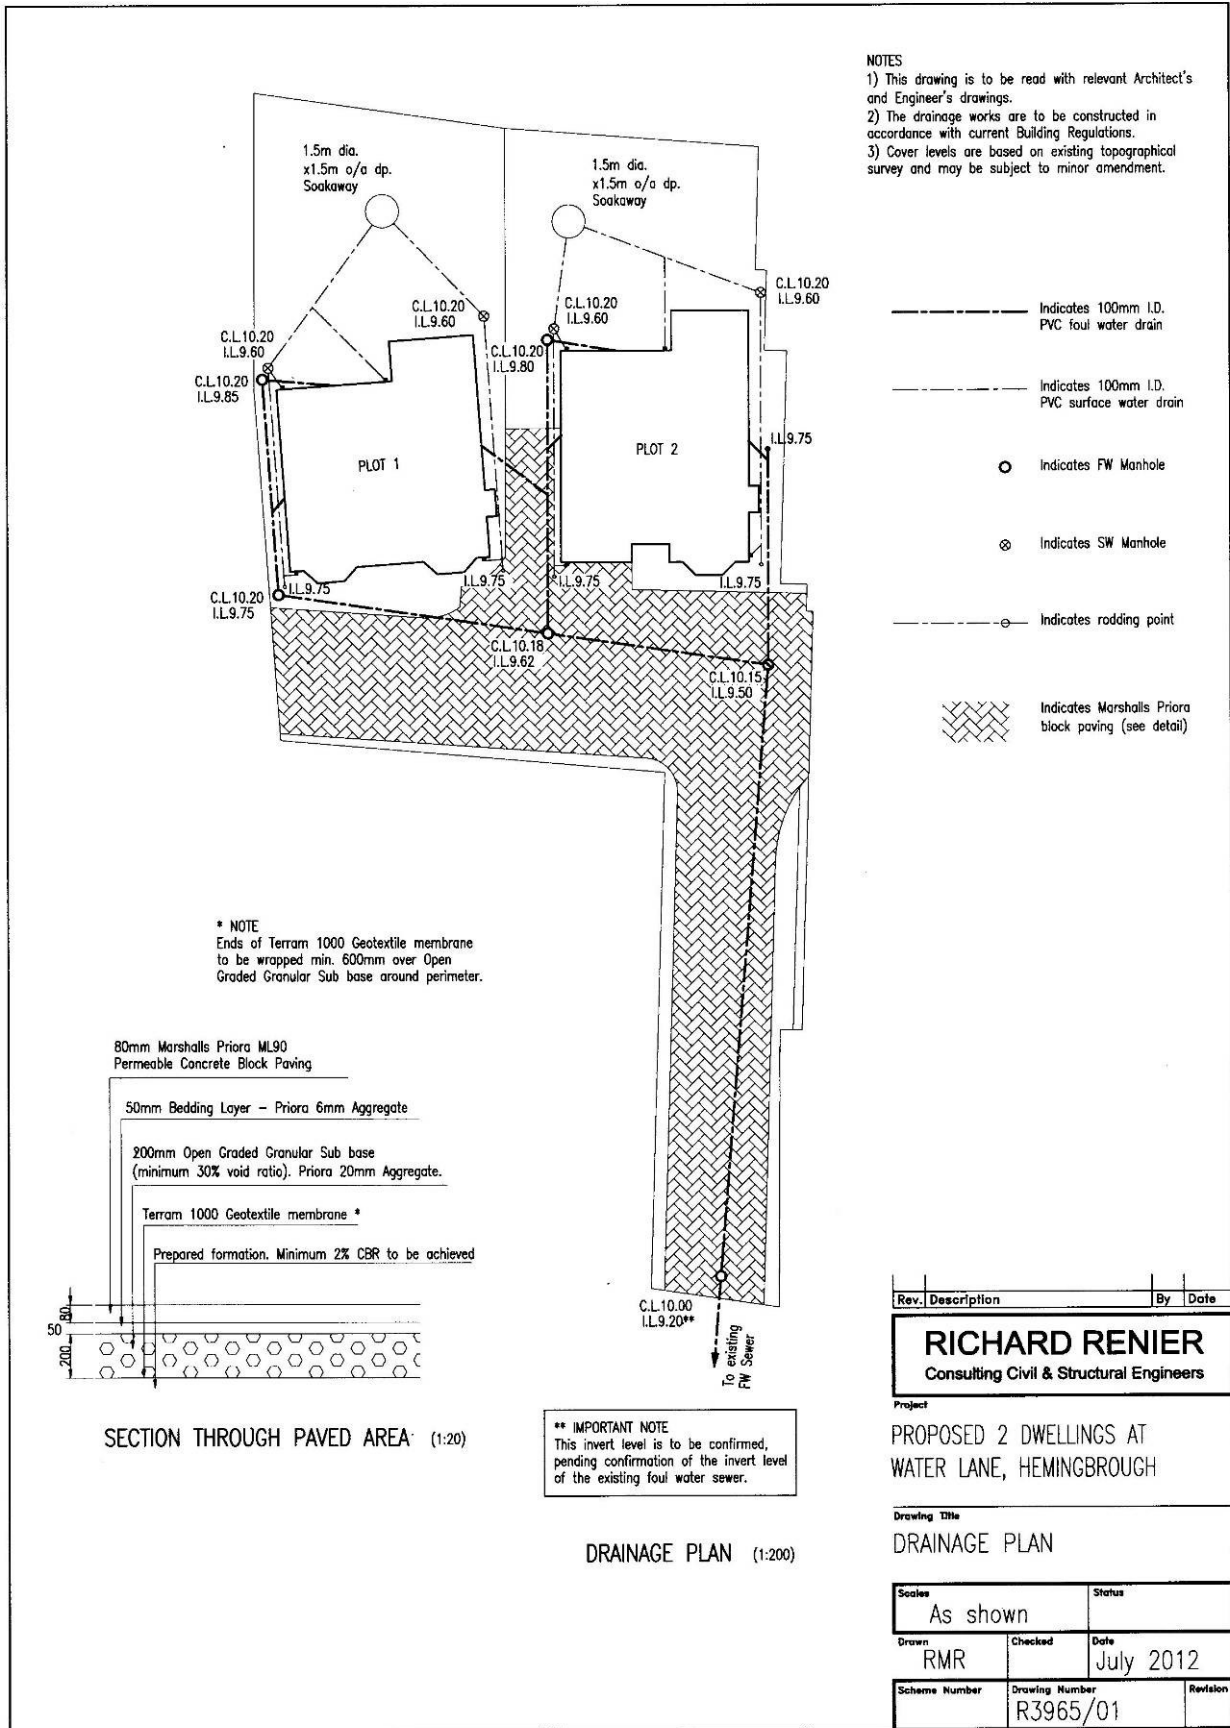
DRAINAGE PLAN AS PROPOSED (not to scale - plan supplied by Richard Renier)
